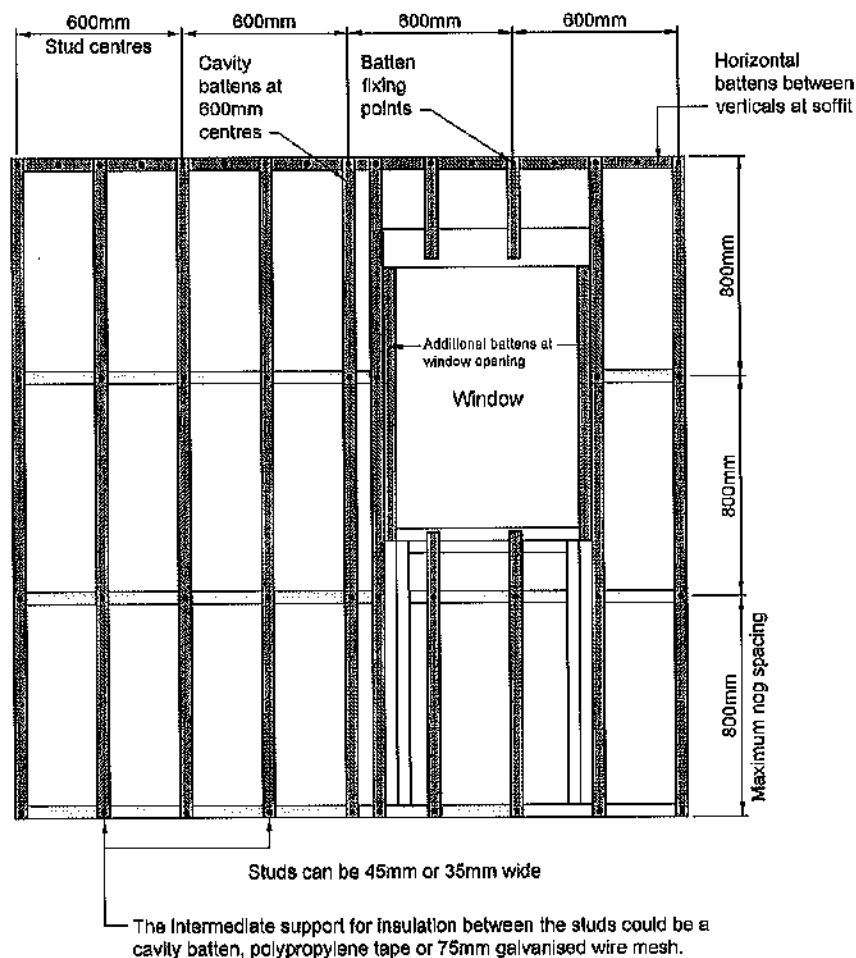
CAVITY BATTEN LAYOUT AT WINDOW OPENING
